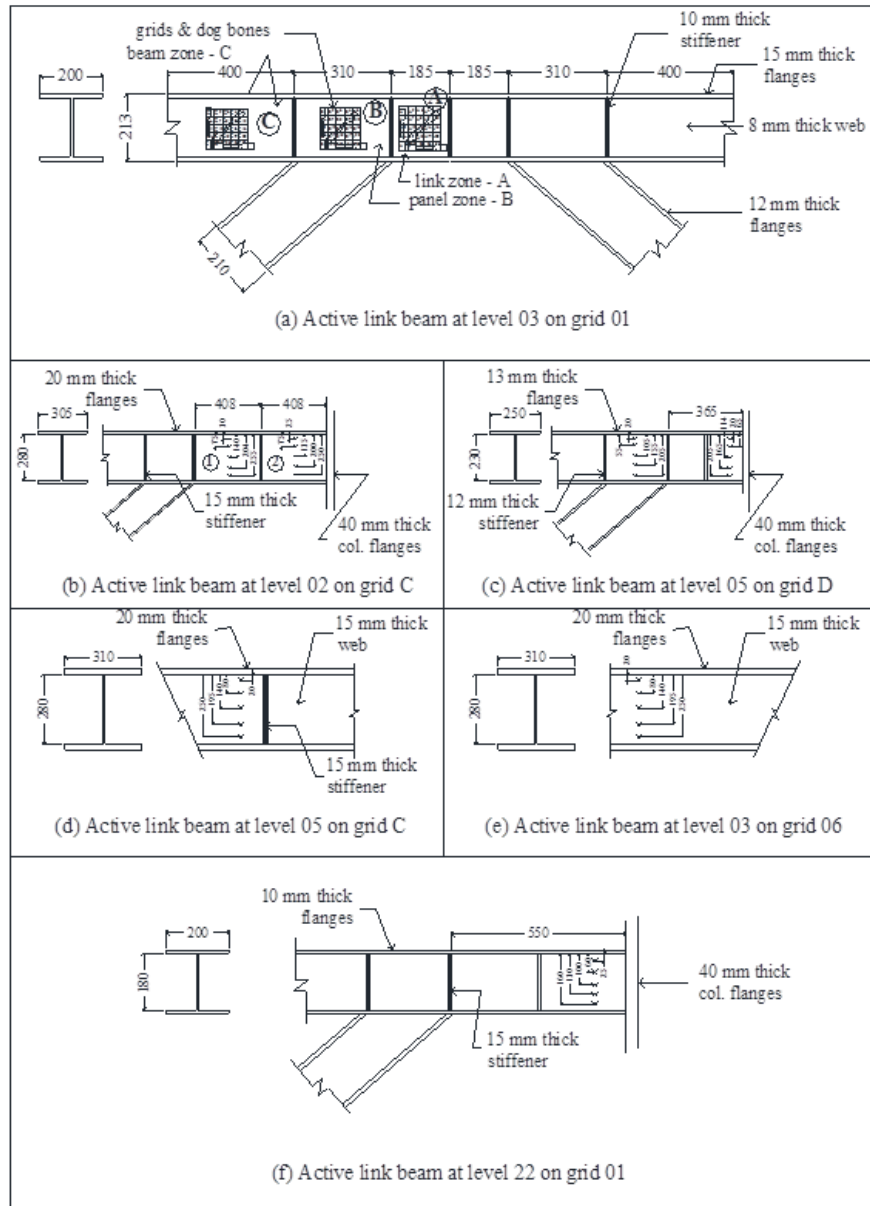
Hardness and tensile test locations, grid details with dog-bone specimen's layout
